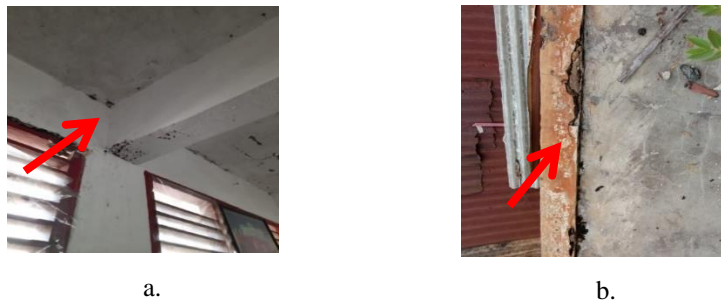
a. Spalling On Beams, b. Cracks in Beams
